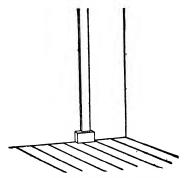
Front View Showing Width of Kick Block to Allow Proper Spacing of Porcelain Tubes
